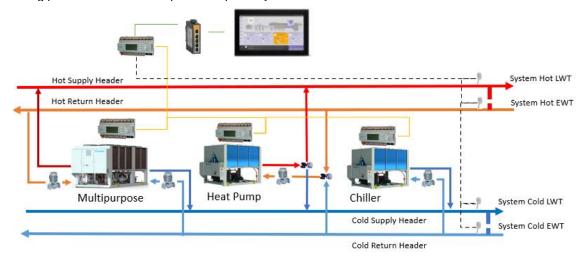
Four-pipe: Multipurpose, A/C Chiller and A/C Hea pump
